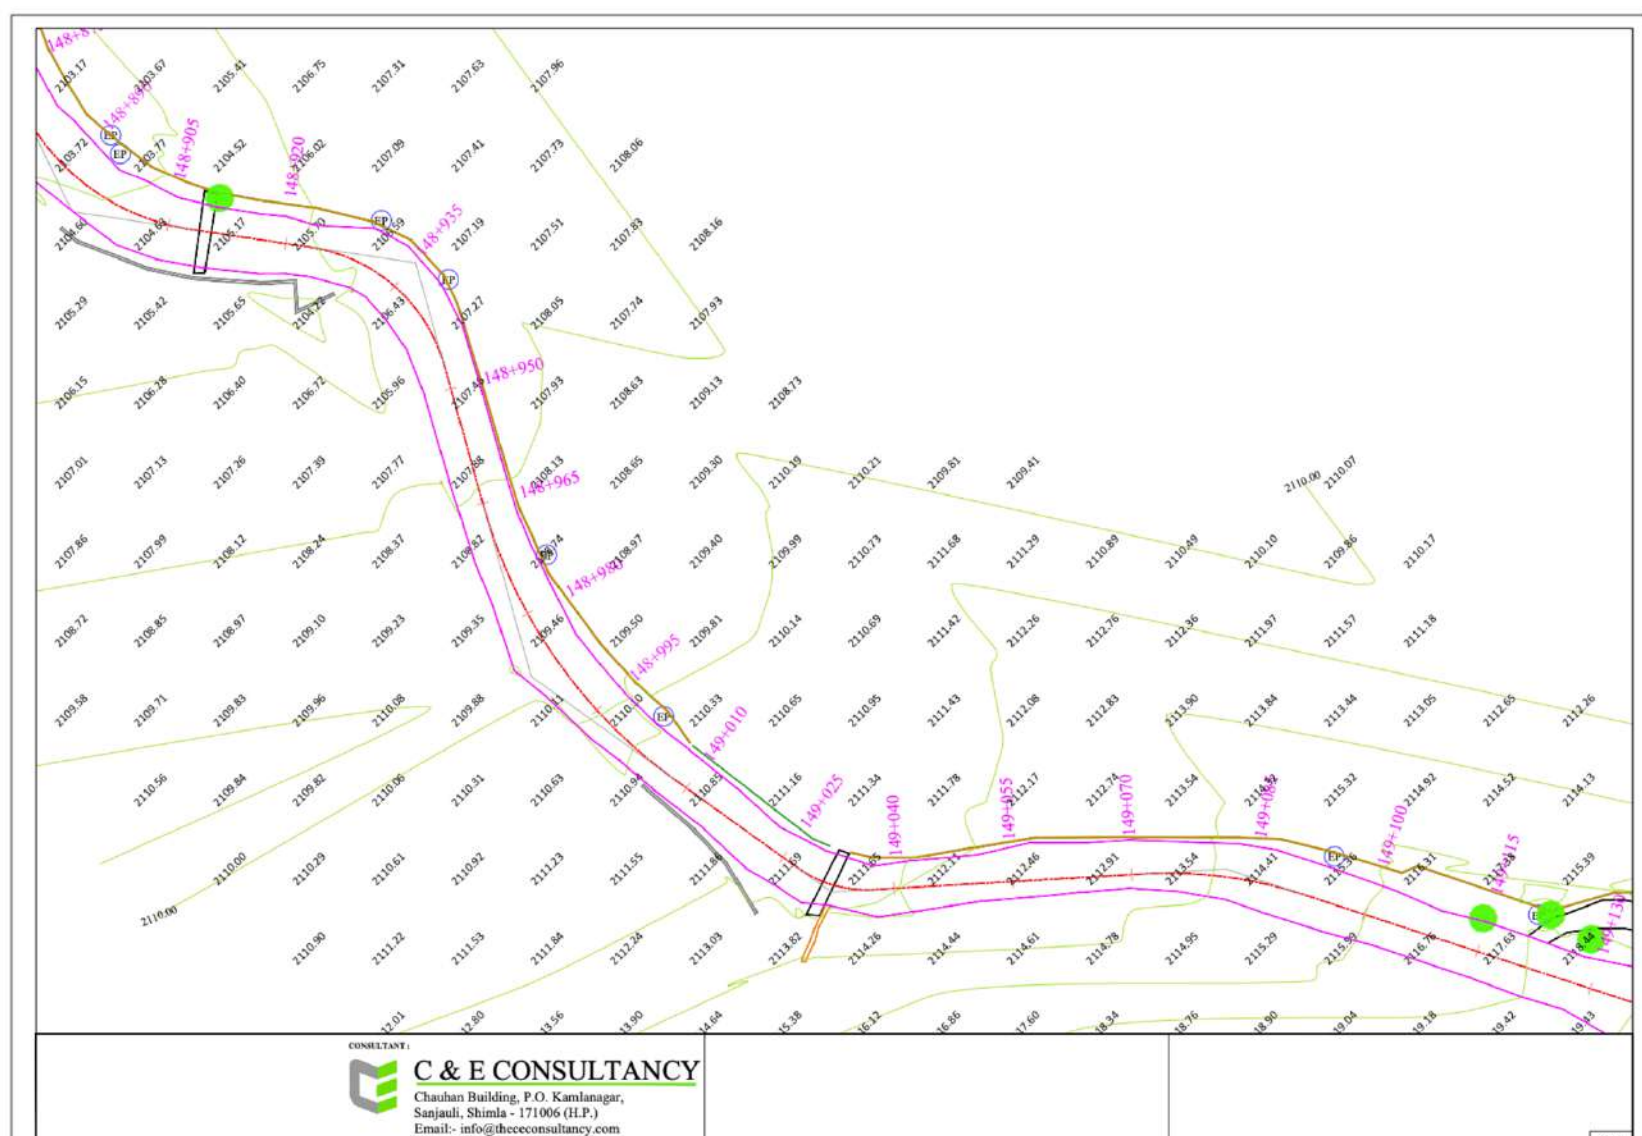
Proposed Road Design for the Improvement of MDR-67 Road Section (Victory Tunnel to Auckland Tunnel) - 7
